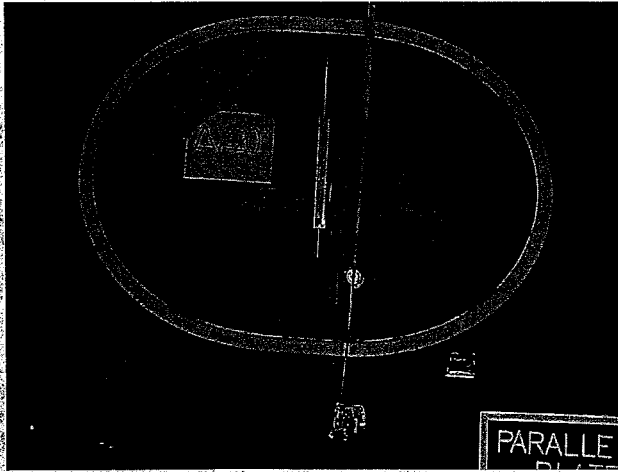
Deformed Elliptical Shape of PVC 36" Pipe at the Vertical Deflection of 20%
